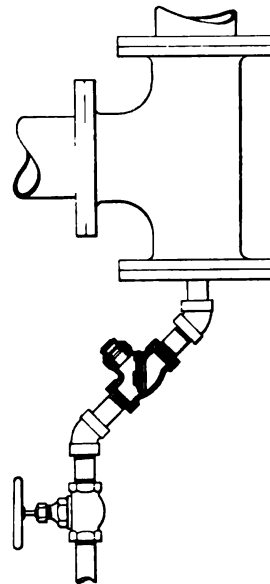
LOCATION OF CHECK VALVE IN DRAIN PIPE
